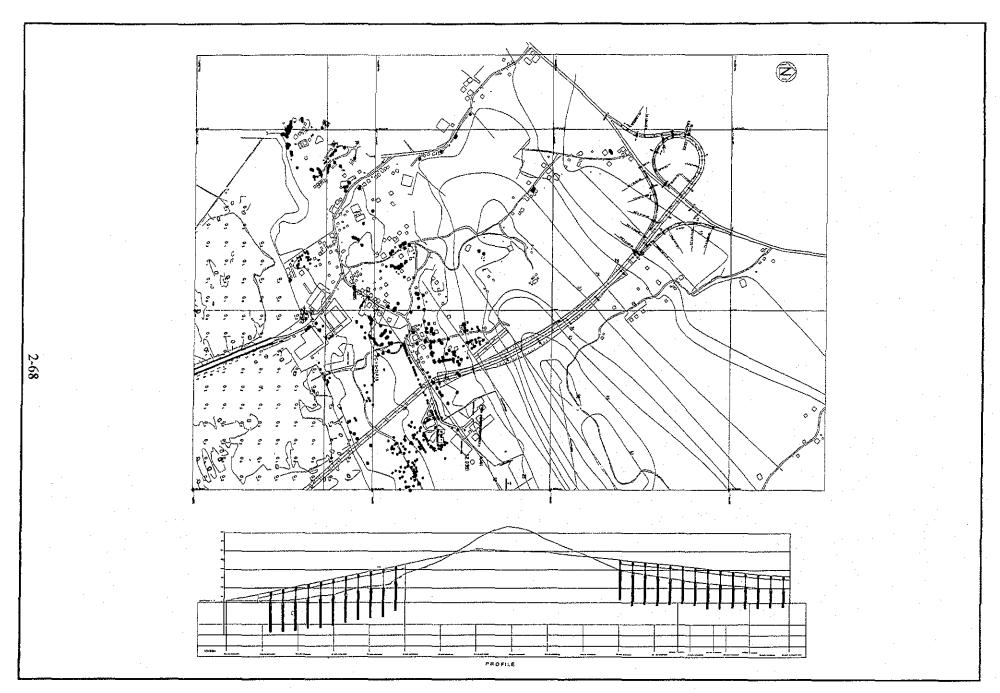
Access Road Alignment and Longitudinal Section
